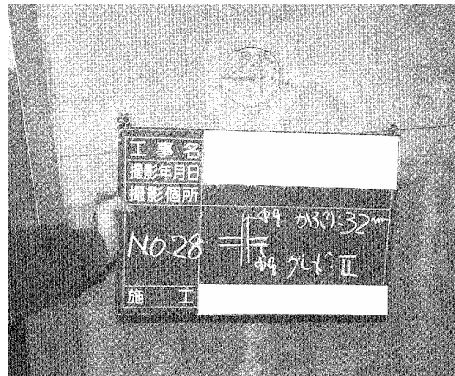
Observing Ripping out Concrete and Observing Rust of Reinforcing Bar
